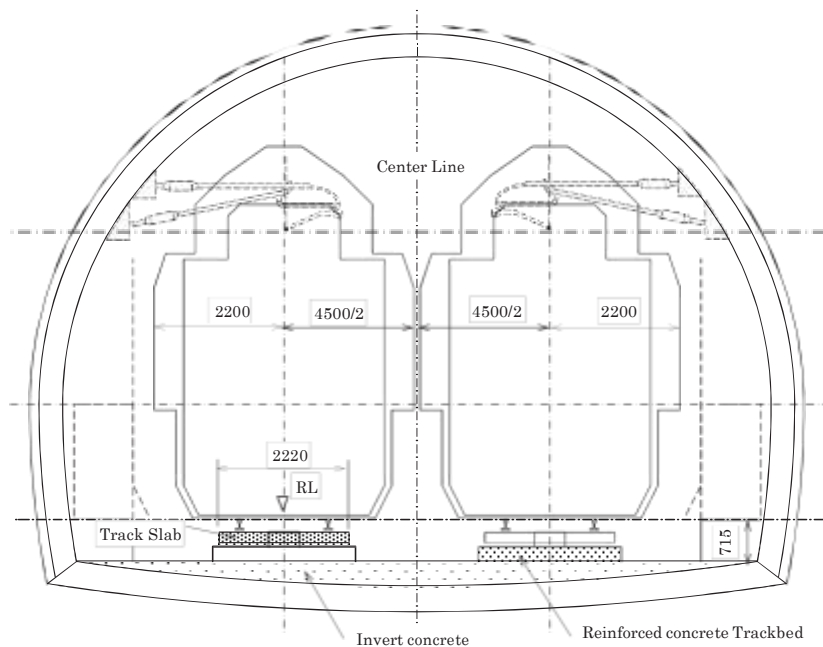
Slab Track Standard Cross-section (Tunnel sections)
